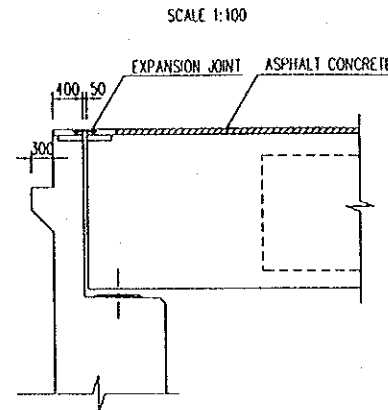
# DETAILS OF EXPANSION JOINTS AT ABUTMENT A1&A2
